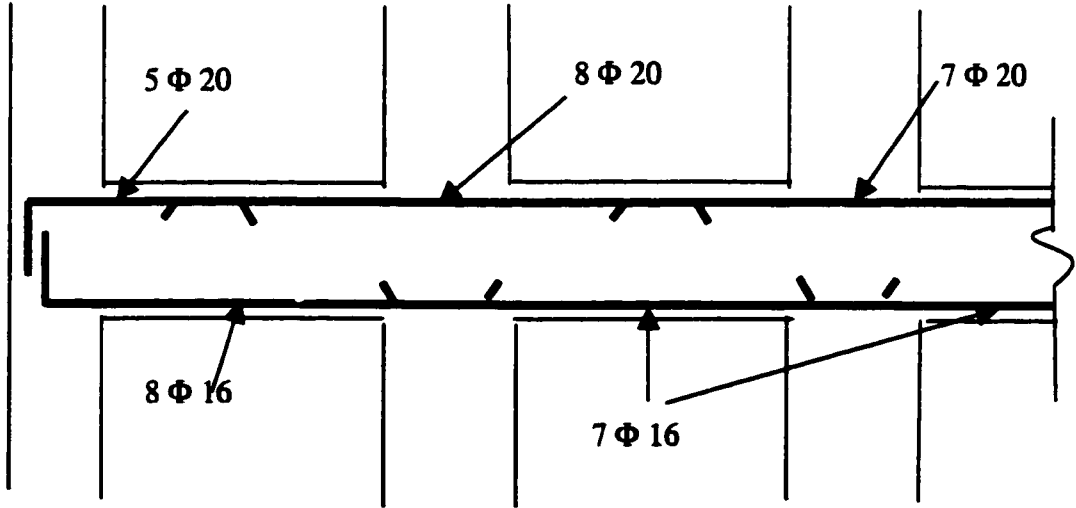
Longitudinal reinforcement in interior beams⁵⁵
